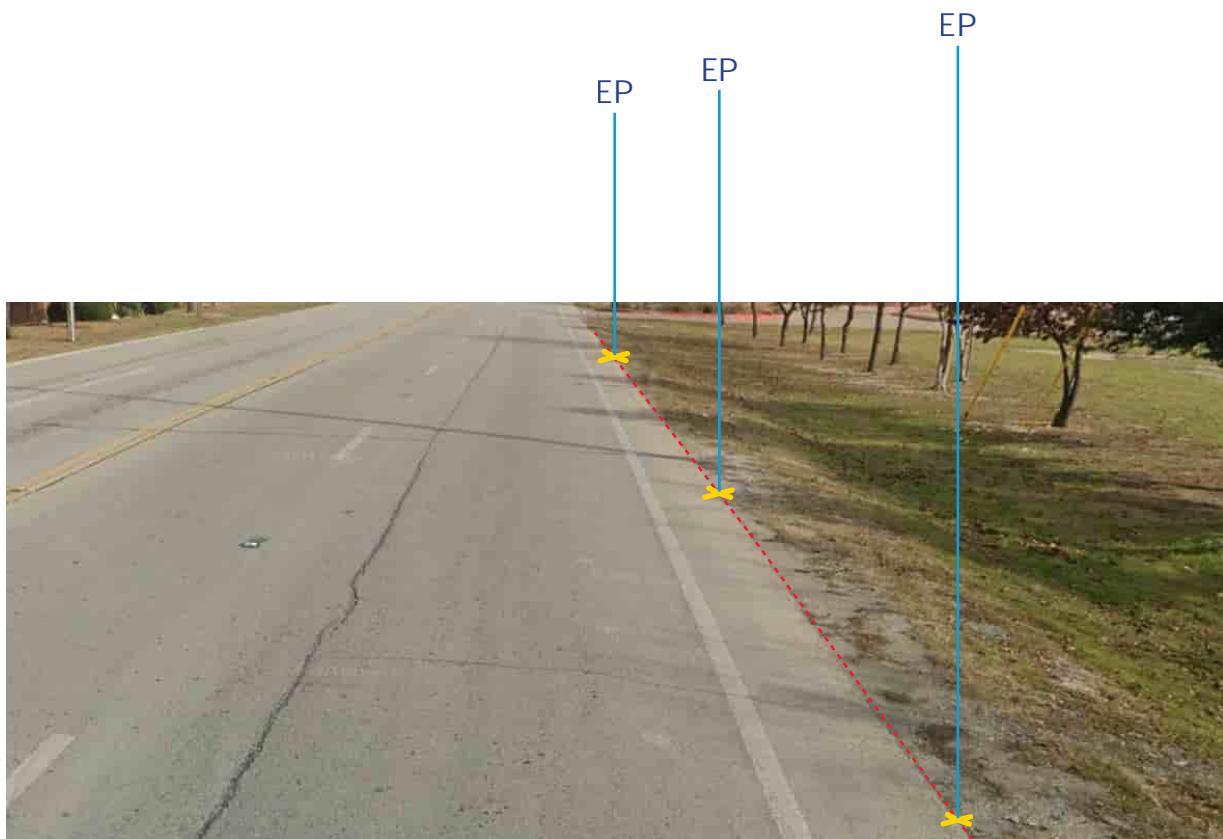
Image showing preferred way of measuring EDGE PAVEMENT
